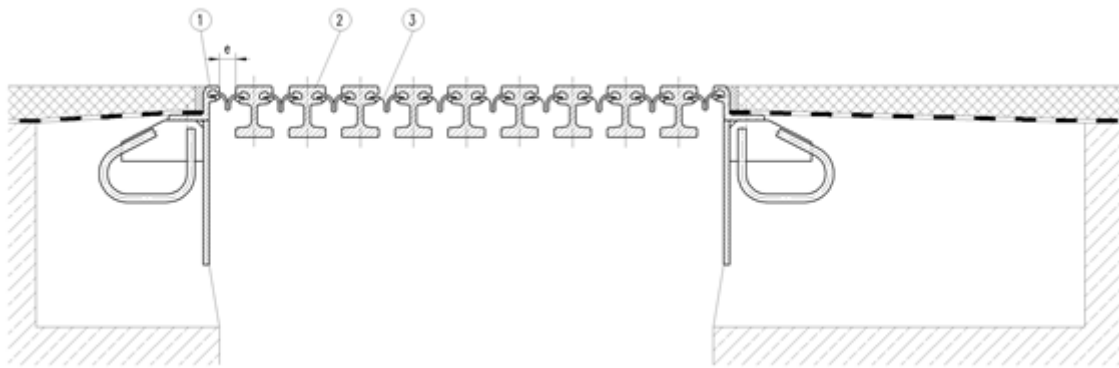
Cross section at carriageway between crossbeams of single crossbeam modular expansion joint with kinematic guidance
